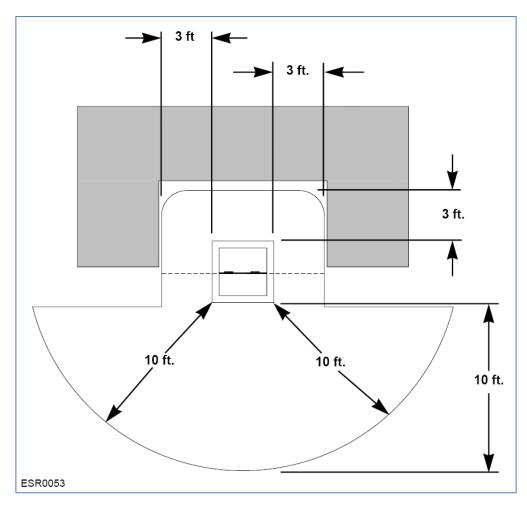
Working Clearances Around Pad-Mounted Electrical Equipment Adjacent to a Noncombustible Structure
